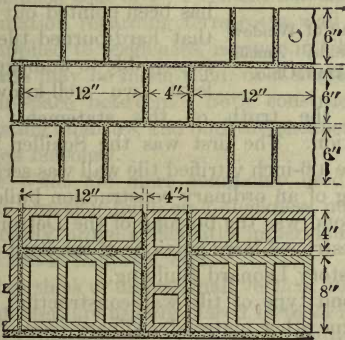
Detail of Hollow Tile Exterior Walls, Amelia Apartments, Akron, Ohio.
